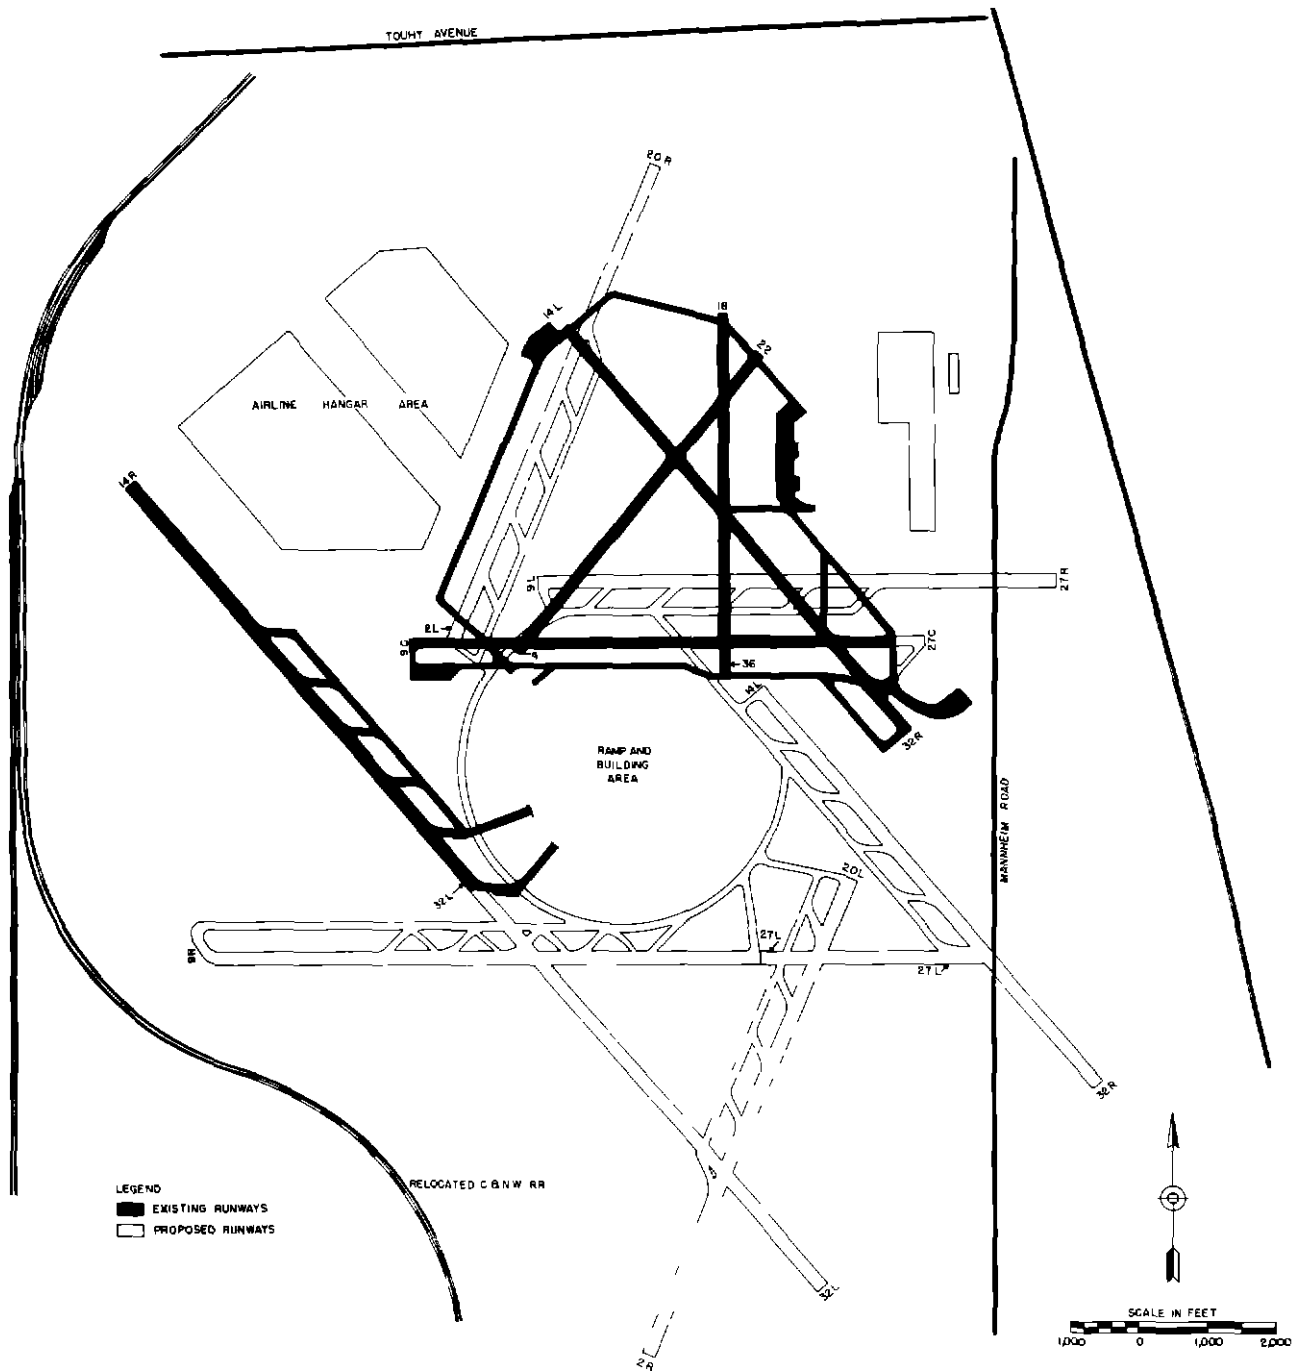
EXISTING AND PROPOSED CONSTRUCTION OF CHICAGO O HARE AIRPORT
